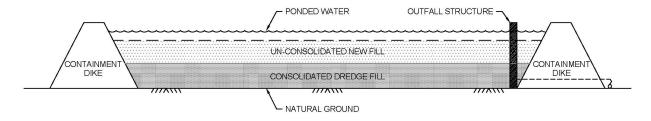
Typical Section of Hydraulic Fill at an Existing UCPA
